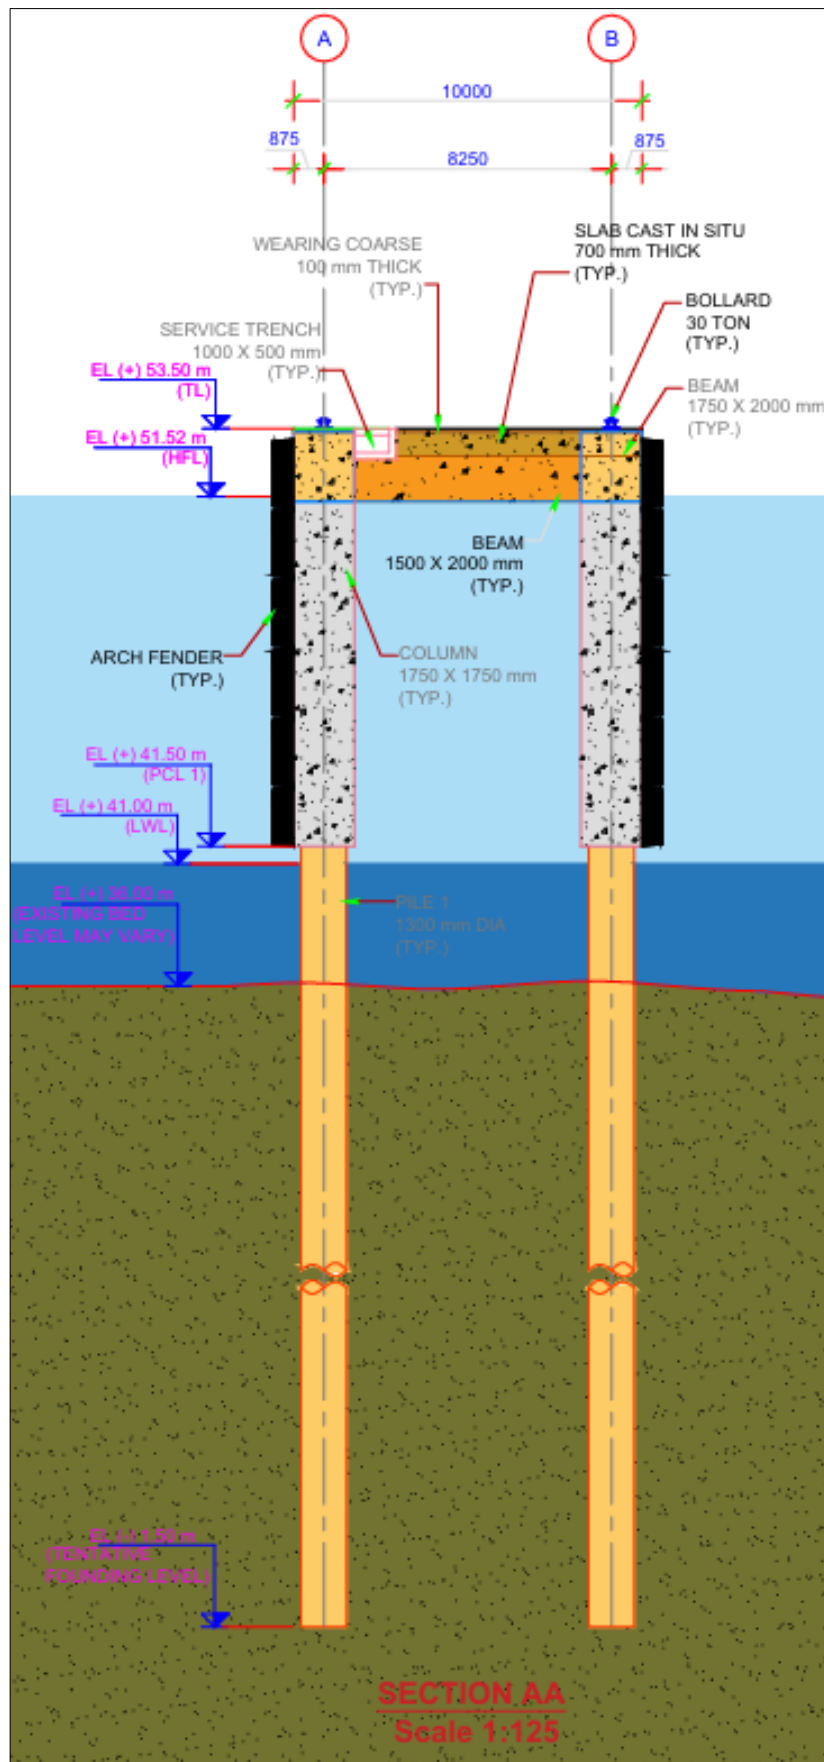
Cross section of Boat Hoist Jetty (Section AA)
